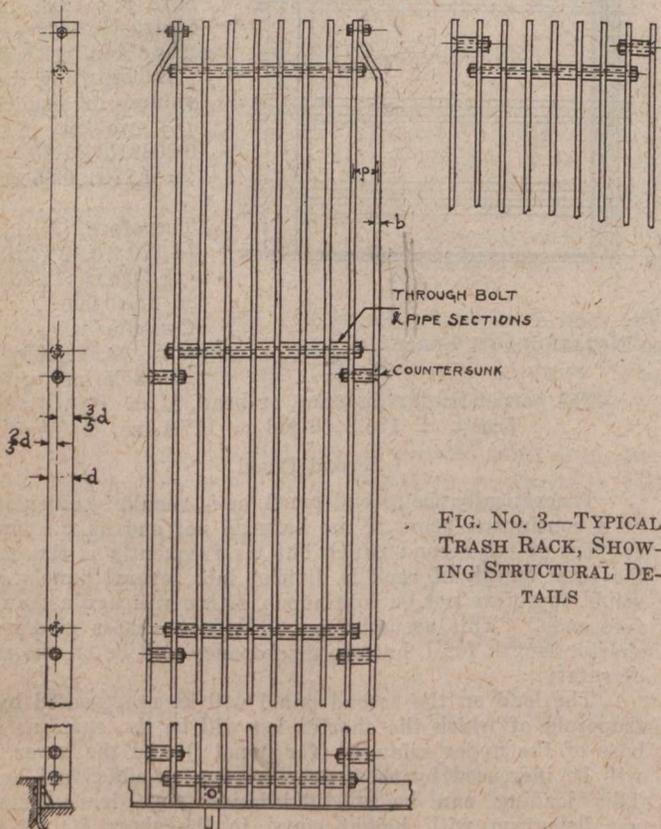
TYPICAL TRASH RACK, SHOWING STRUCTURAL DETAILS
